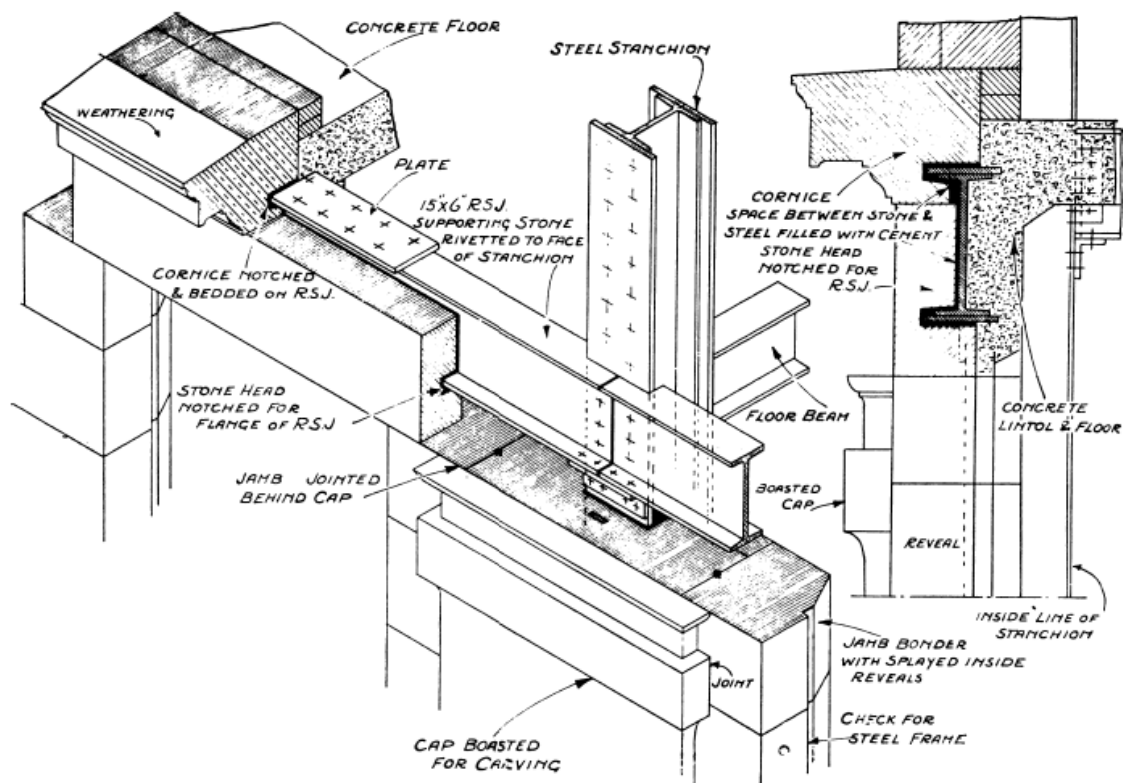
Details of masonry cladding to steel-framed building (from Warland, 1953)
